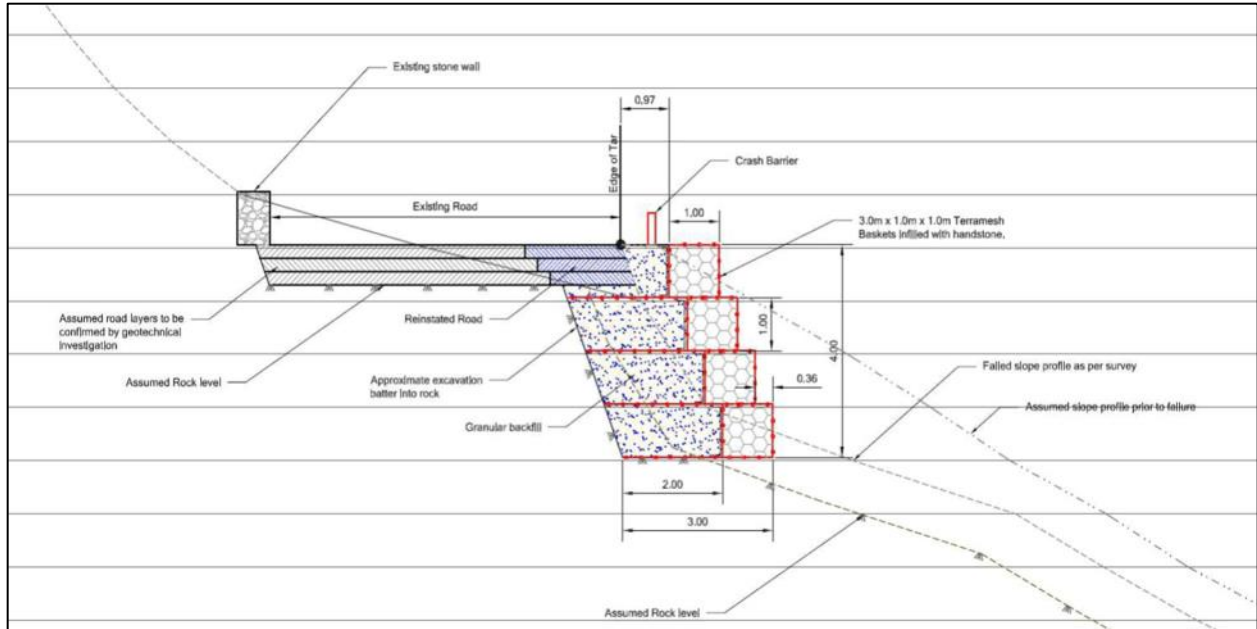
Terramesh retaining wall concept (Ingerop, 2024)
